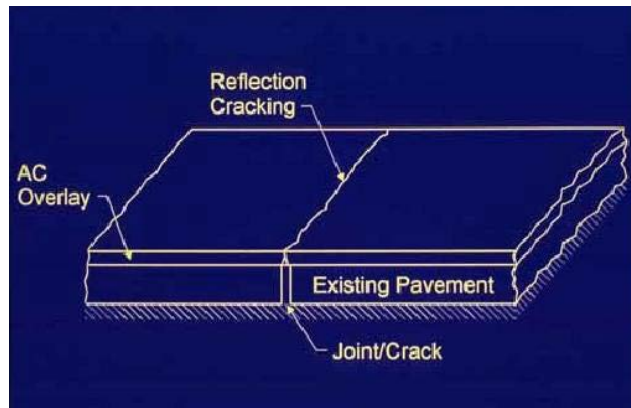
Propagation of reflective crack from the existing concrete pavement into the new asphalt overlay (13).
